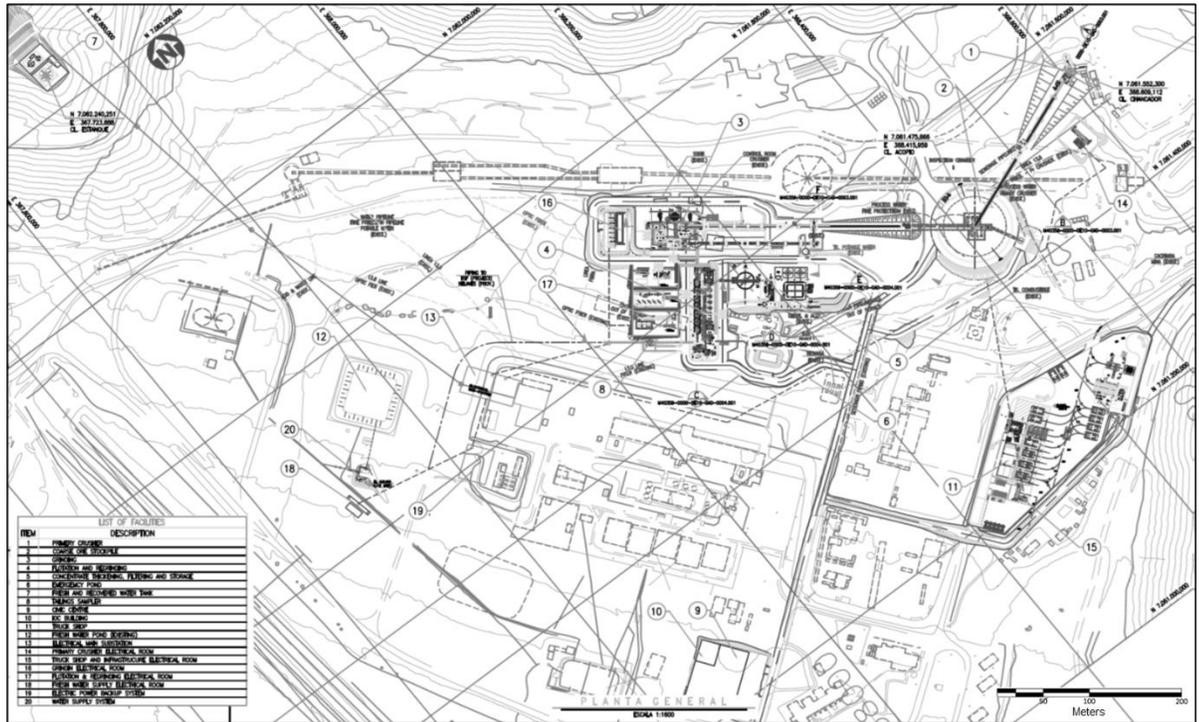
shows the current plant area layout. Figure 18-2 shows the layout of the process plant area for the MVDP.
